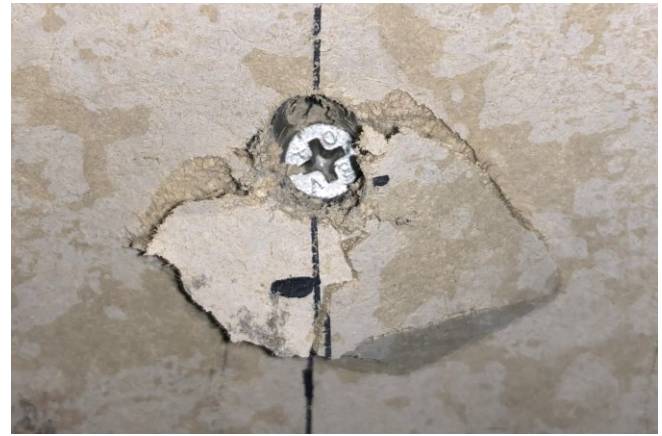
Bearing failure onto the board for a single stud specimen
